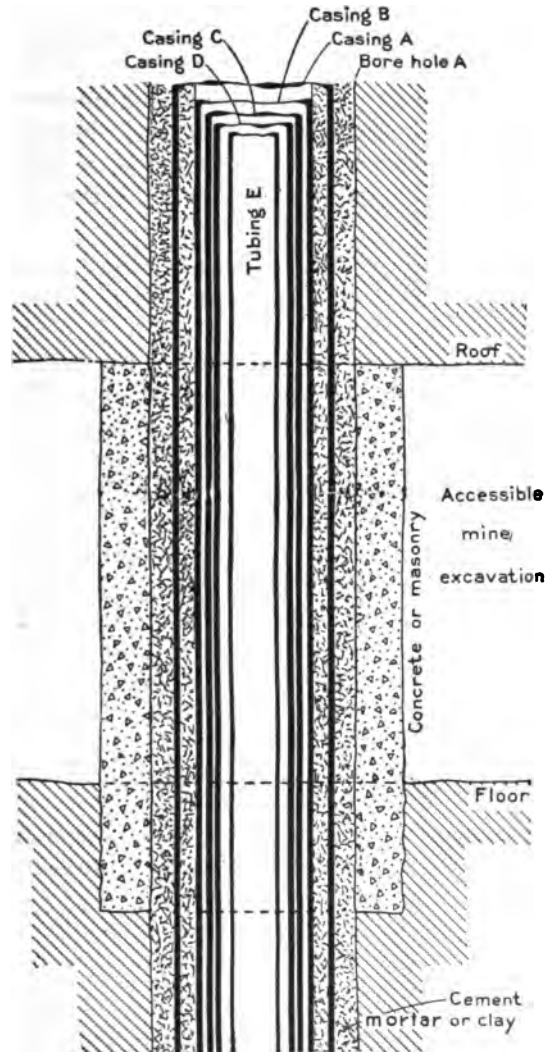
Method of protecting exposed casing with concrete or masonry.
